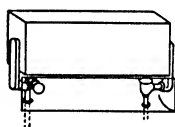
HEATING UNIT VALVES BEHIND GRILLE
